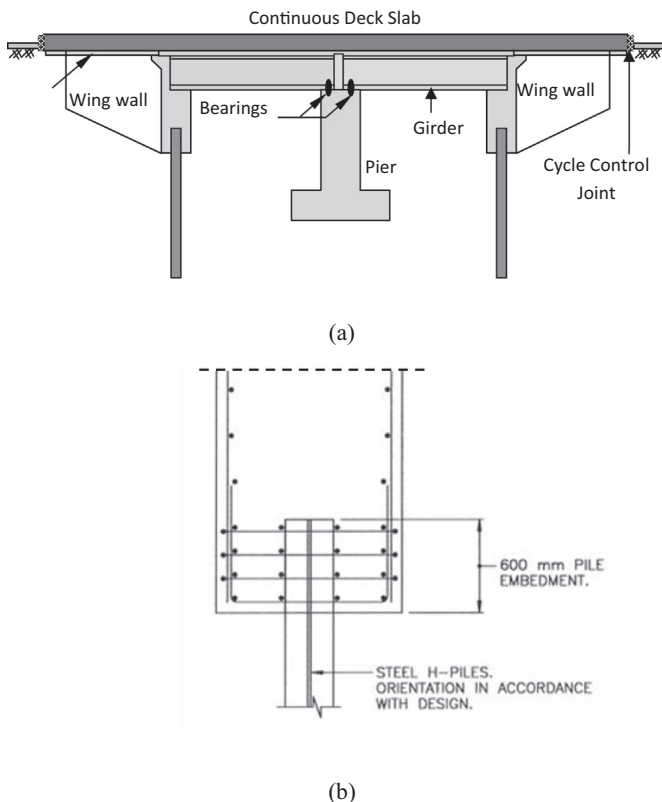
(a) Typical jointless bridge, (b) pile-abutment connection detail.
